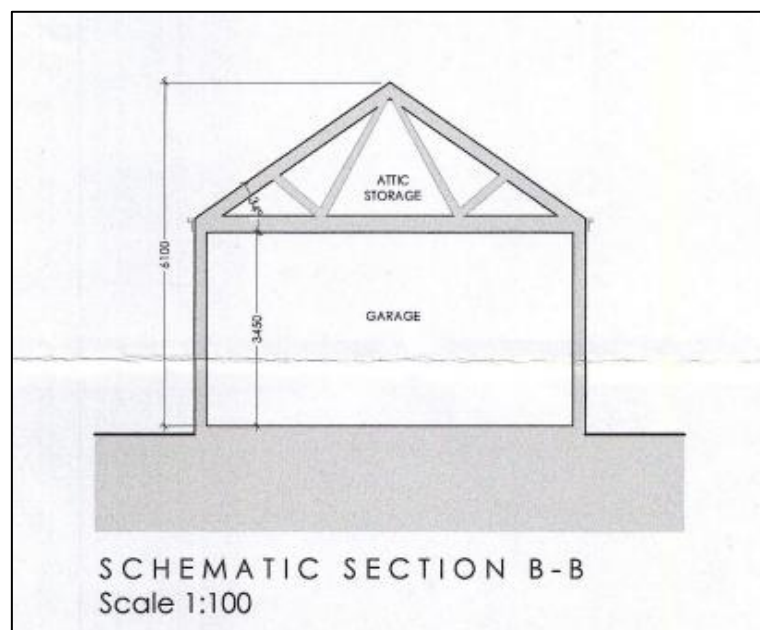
SECTION OF PROPOSED GARAGE BUILDING SHOWING ATTIC SPACE.
